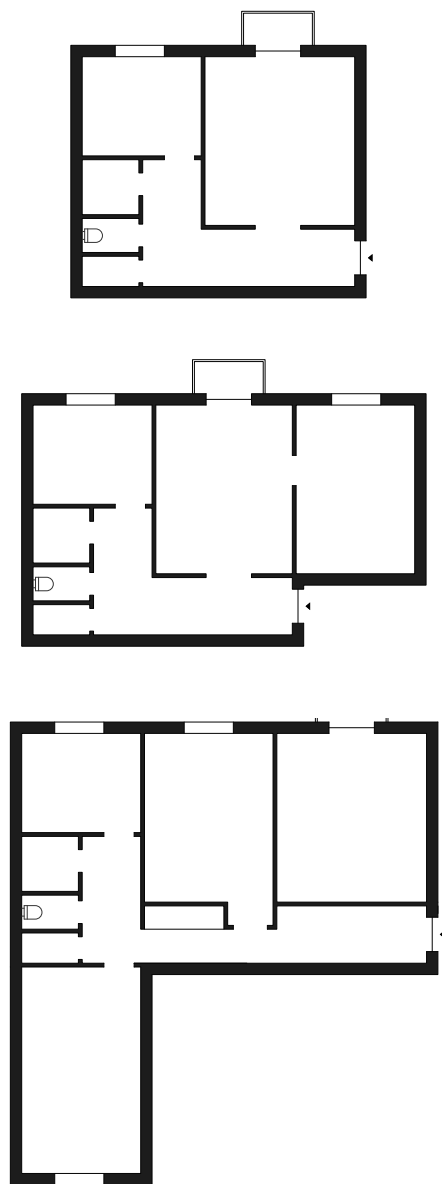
Plan, Stalinka in Kazan - 1:200
